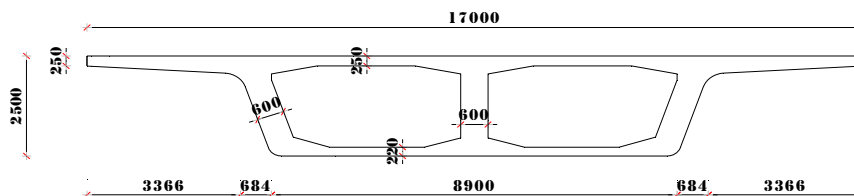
Typical section for the case study bridge (Dimensions in mm)
